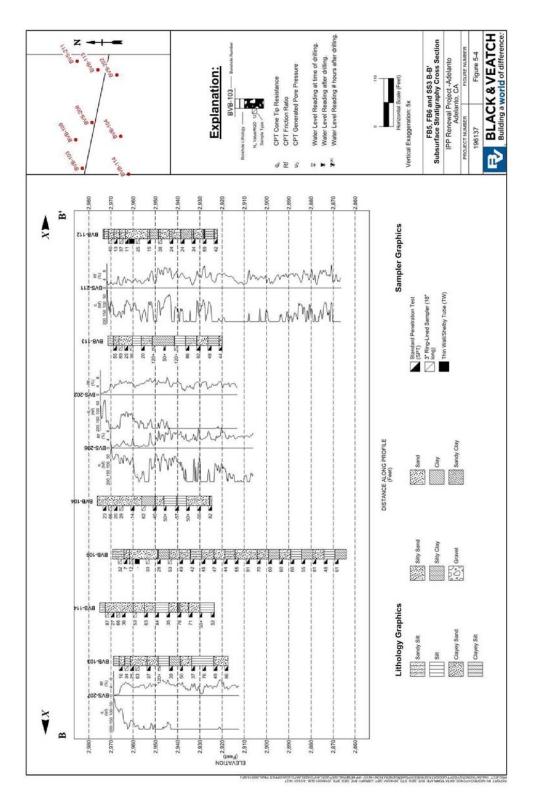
Subsurface Stratigraphy Cross Section B-B' (See Figure 4-2 for location plan)
